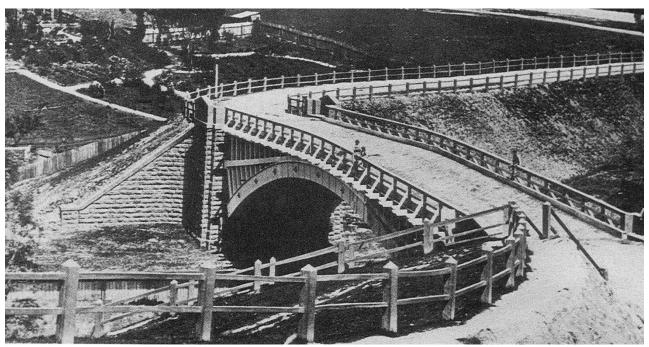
First Johnston St bridge, a laminated-timber bridge crossing built in 1858 and crossing 52 m. *National Trust
